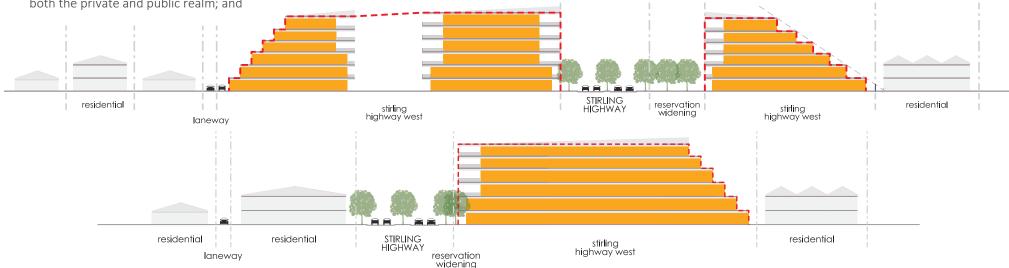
Cross Section A-A and B-B shown spatially on Figure 15, outlining the potential built form envelopes for new development within the Stirling Highway West Urban Corridor Planning Area.
